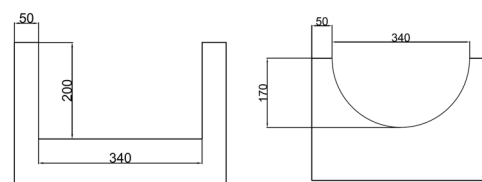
Cross-Sectional Dimensions of Drainage Trenches (Unit: mm).
